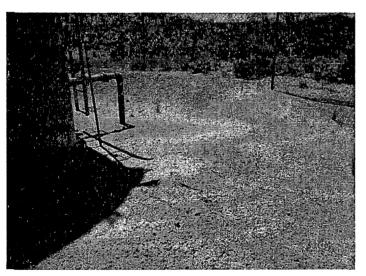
View to the west. Area immediately north of the Caviness Ranch north tank before restoration
